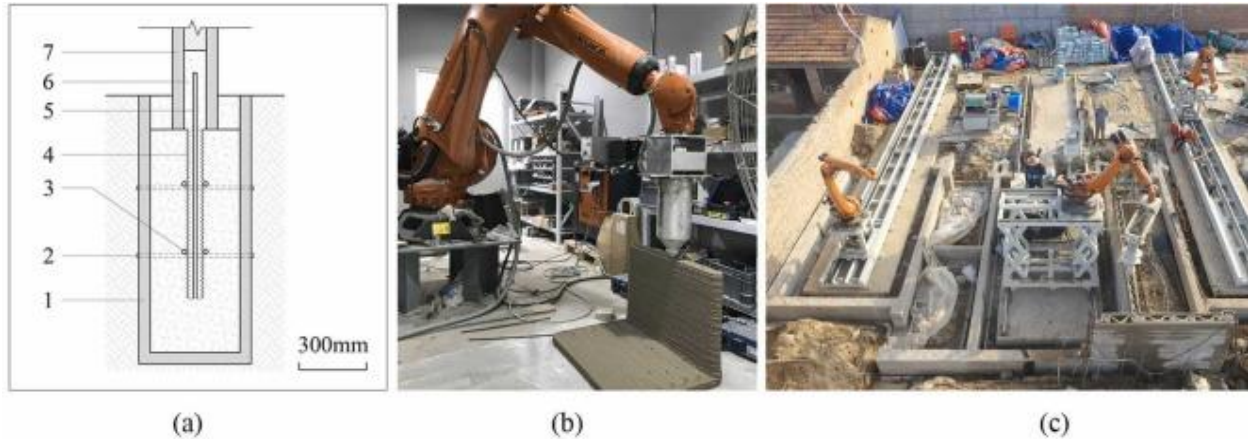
Trench detail from Tsinghua University's farmhouse prototype
